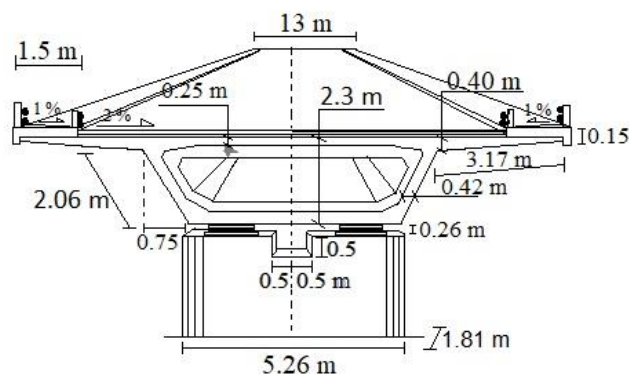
Cross-section and dimensions of the Arosa coastal and concrete bridge.
